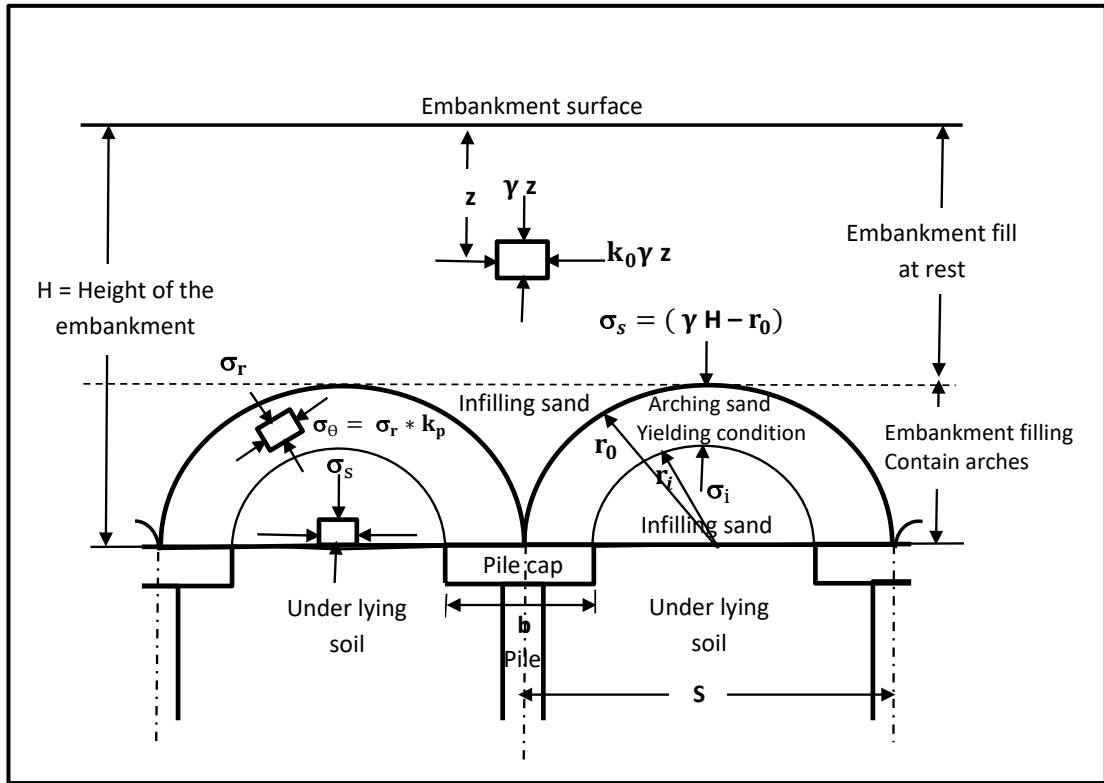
Section through piled embankment (Hewlett and Randolph 1988).
